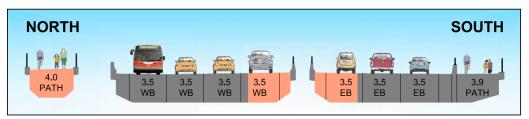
CP Proposed Ultimate Bridge Cross Section
